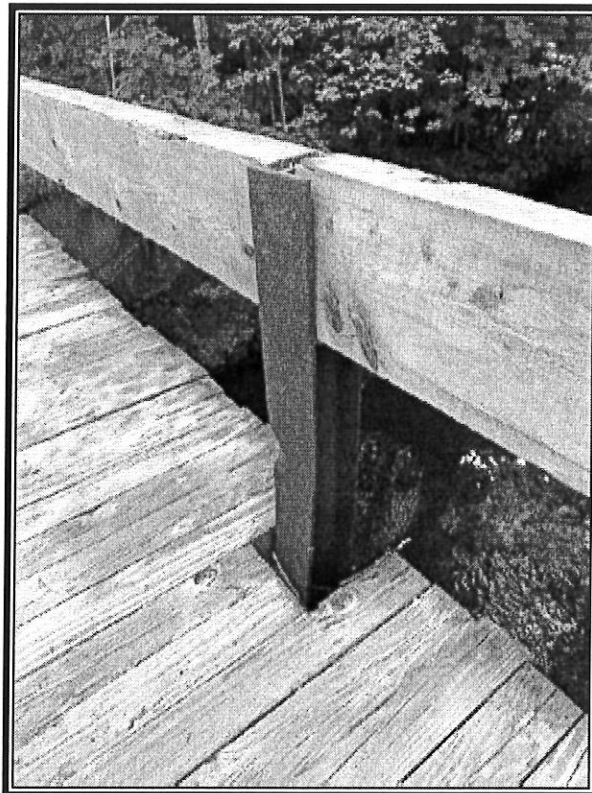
The bridge rail, approximately 27 inches from the deck surface.
